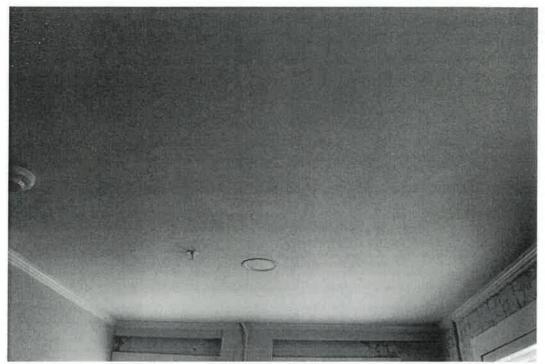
Sheet rock ceiling in third floor southernmost unit
